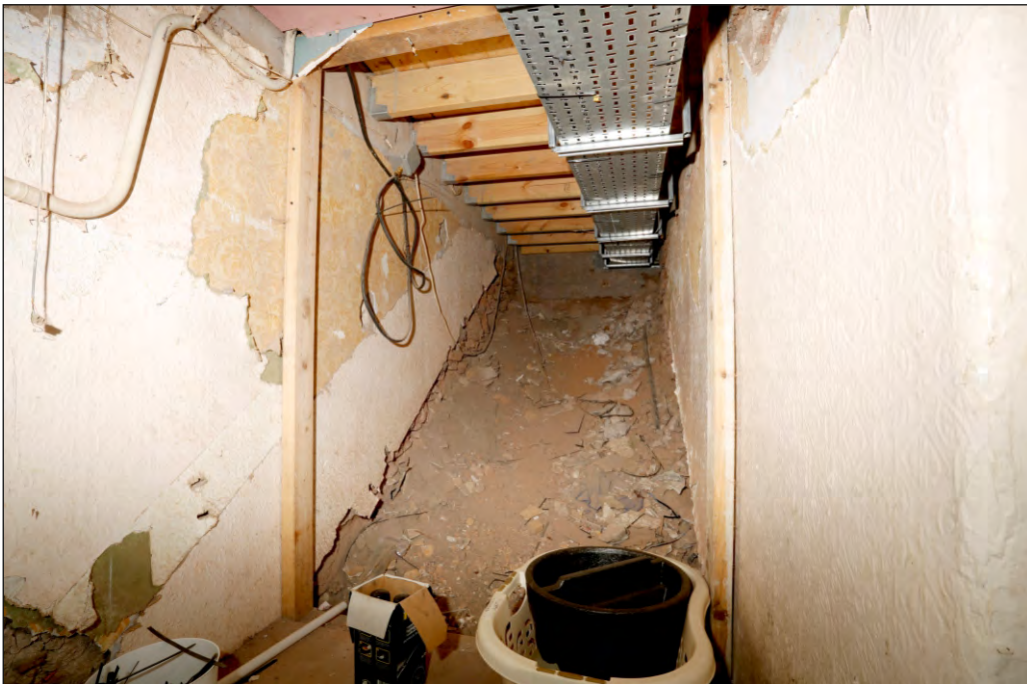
Former access stairs to lower ground floor rooms (stairs now removed)
